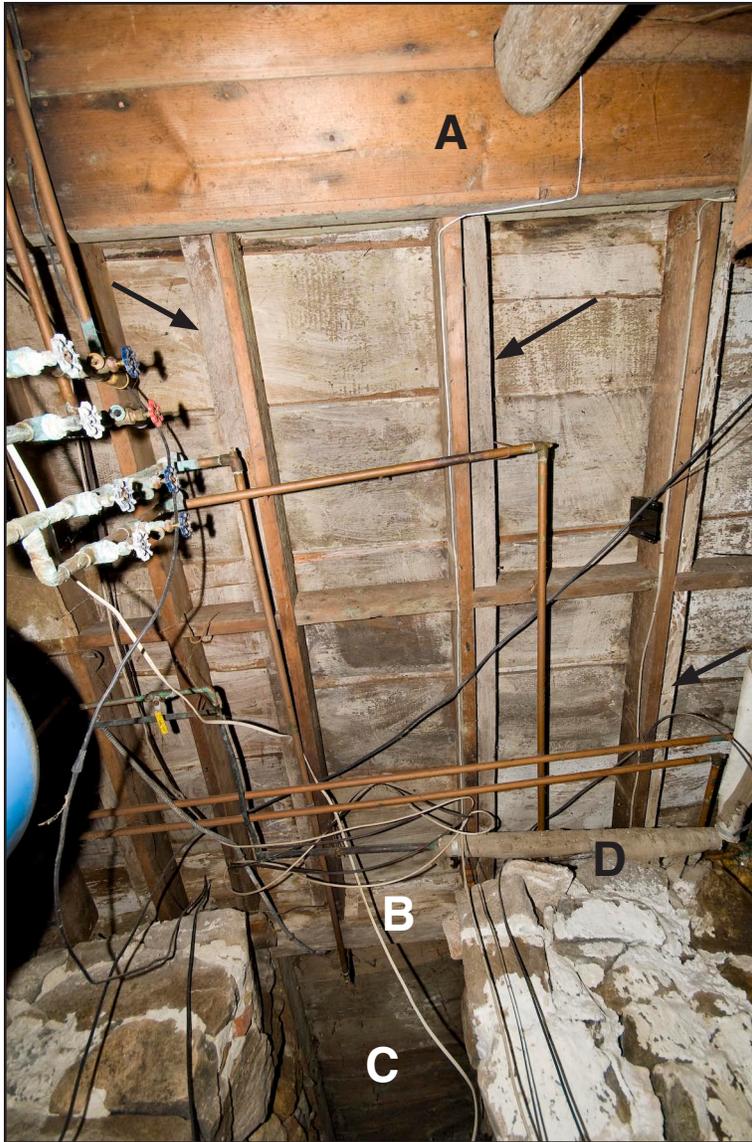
Cellar framing under the original parlor looking towards the east wall of the cellar. "A" marks the summer beam that has been enclosed with modern boards, "B" marks the chimney girt, and "C" indicates the opening in the foundation that originally held the stairs to the cellar. The arrows point to original parlor floor joists that have been sistered with modern 2x4s to reinforce the floor framing. "D" indicates some pipe insulation that should be tested for the presence of hazardous materials by a hazardous materials professional.
